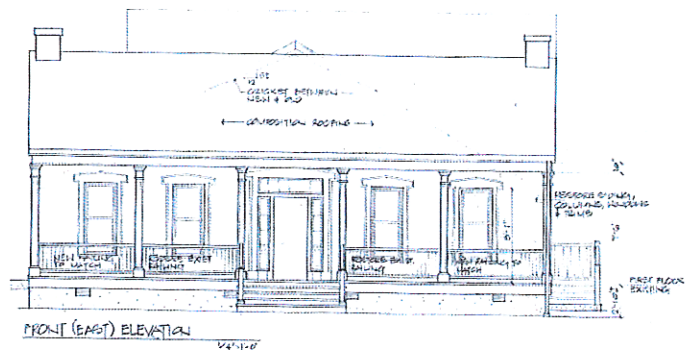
Existing east facing side (front porch) of the primary dwelling.
